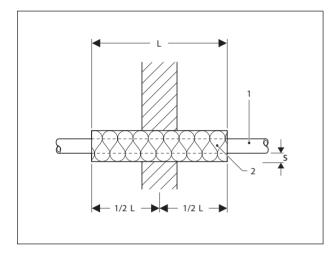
Fire protection, Geberit Mepla Ø 16 - 75mm: Wall penetration, solid wall
